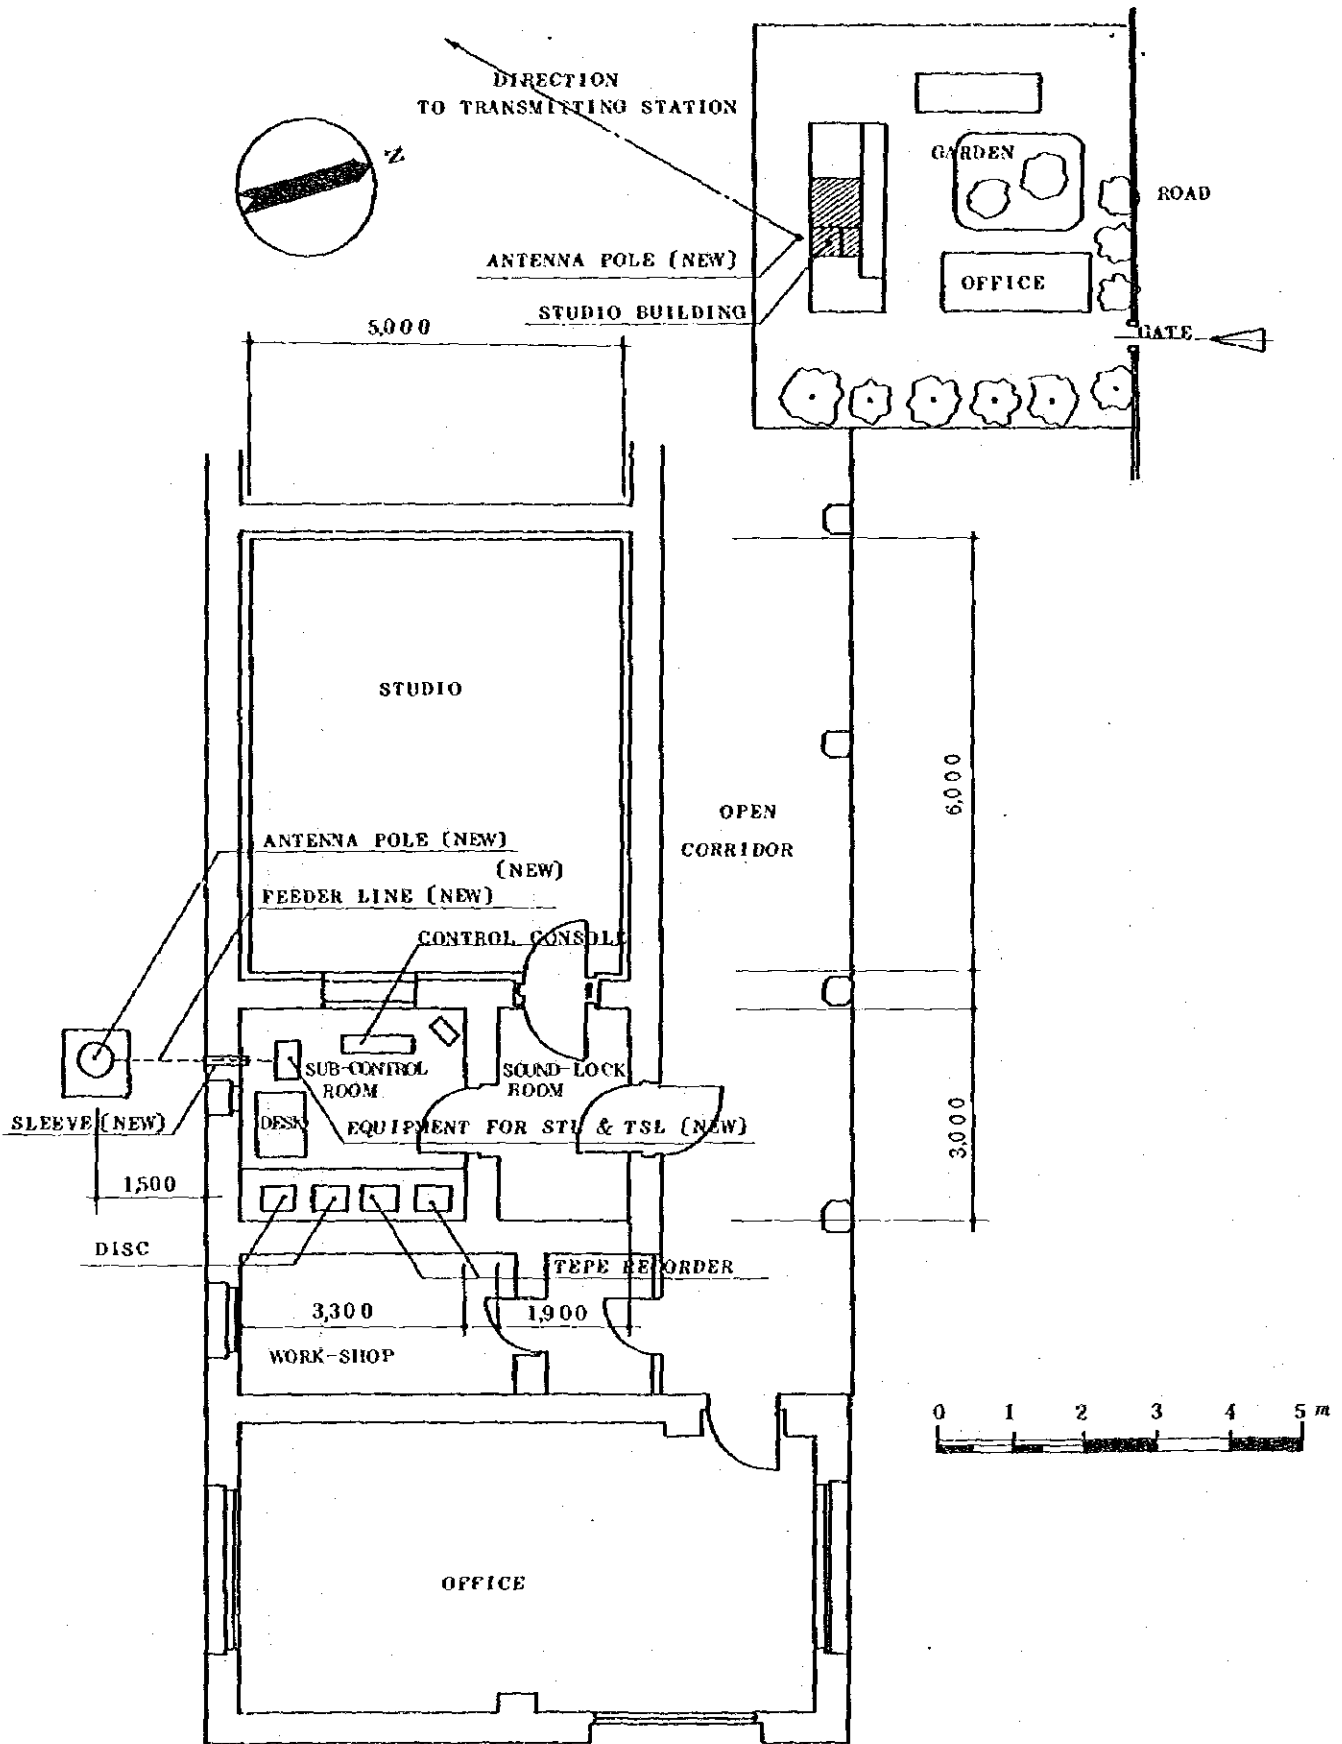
Layout of Equipment and Other Facilities (Kassala)
